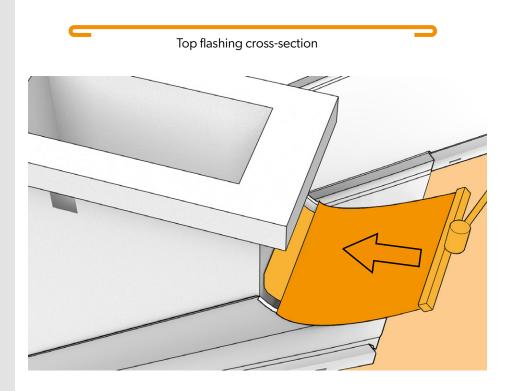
UPPER STACK FLASHING ASSEMBLY
